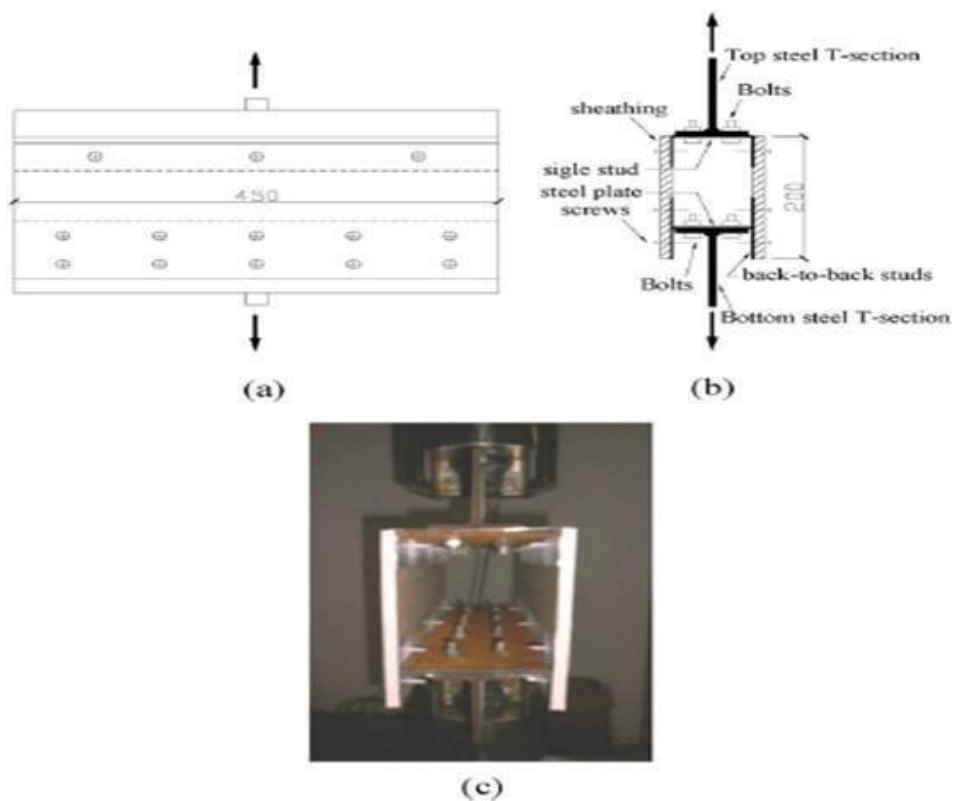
Screw connection test setup (a) Front (b) Profile (c) Test setup [18]
